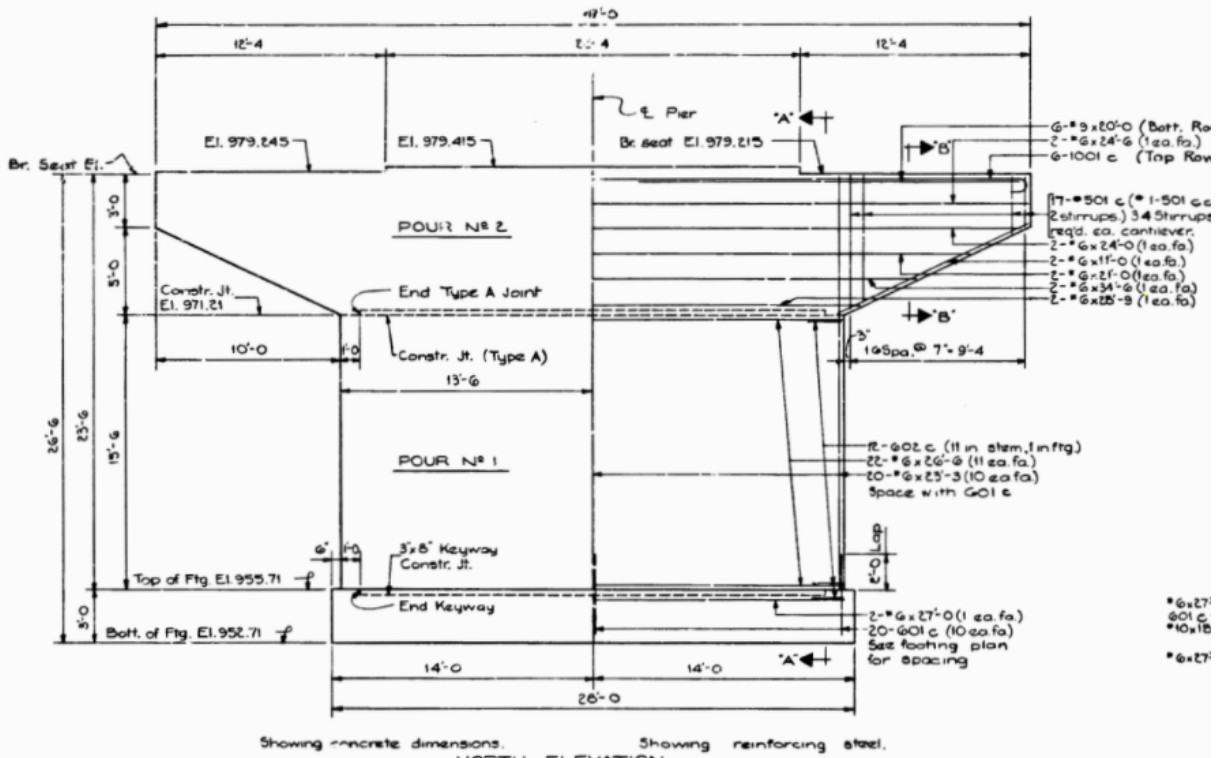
Transverse Elevation of Interior Pier (NBI 24210) (1971)
